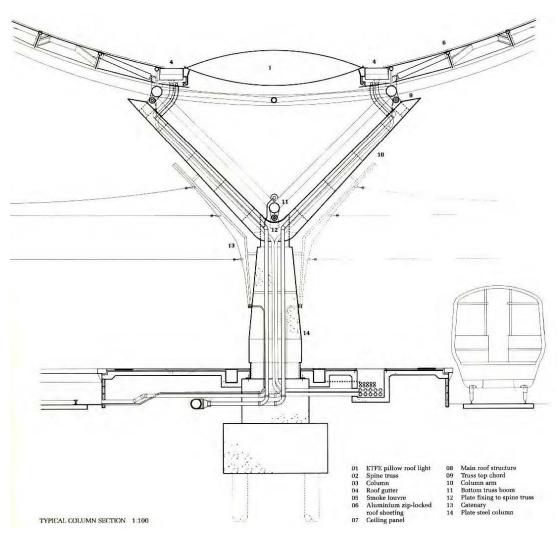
Section through the roof structure. Source: (Raisbeck, 2007)
